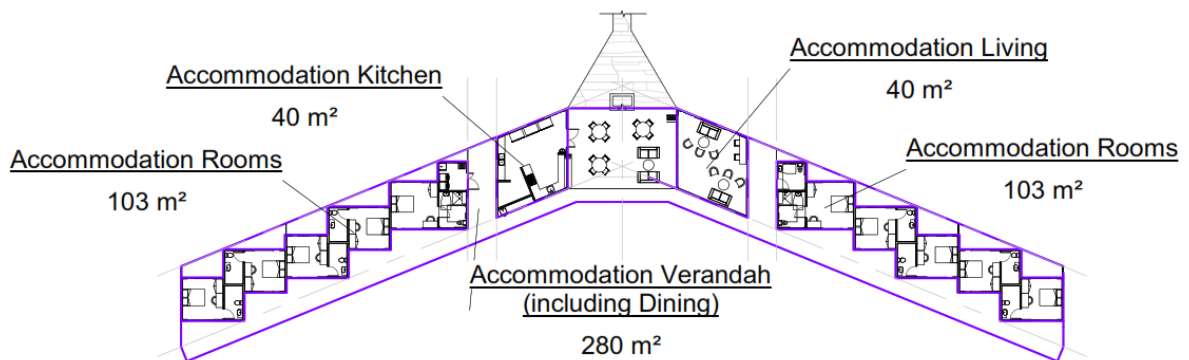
Floor Plan of Proposed Main Accommodation Building (Source: BAU Design Architects, 2021)
